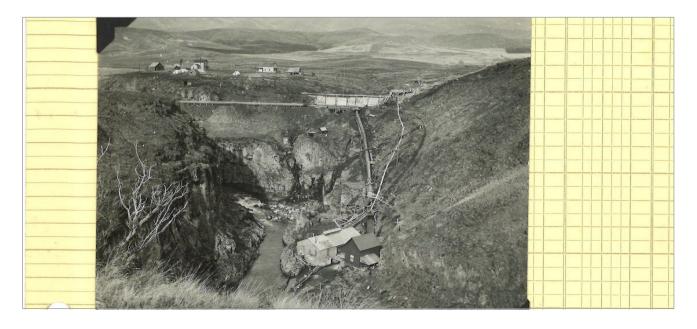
Ca. 1911 reservoir dam construction photograph. Looking north showing the new penstock alignment, and the powerhouse prior to the north addition. Source: OPRD.
